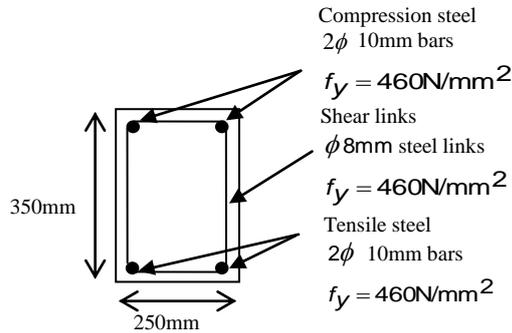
Cross Section Details for the Reinforcement used in Beams Panels.
